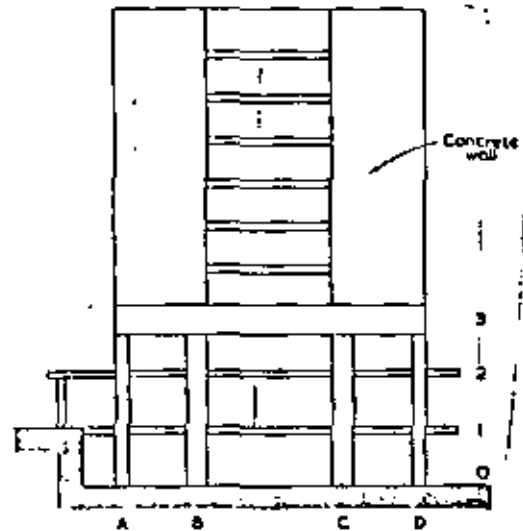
Schematic cross-section of building damaged during Caracas 1967 earthquake¹⁷.
